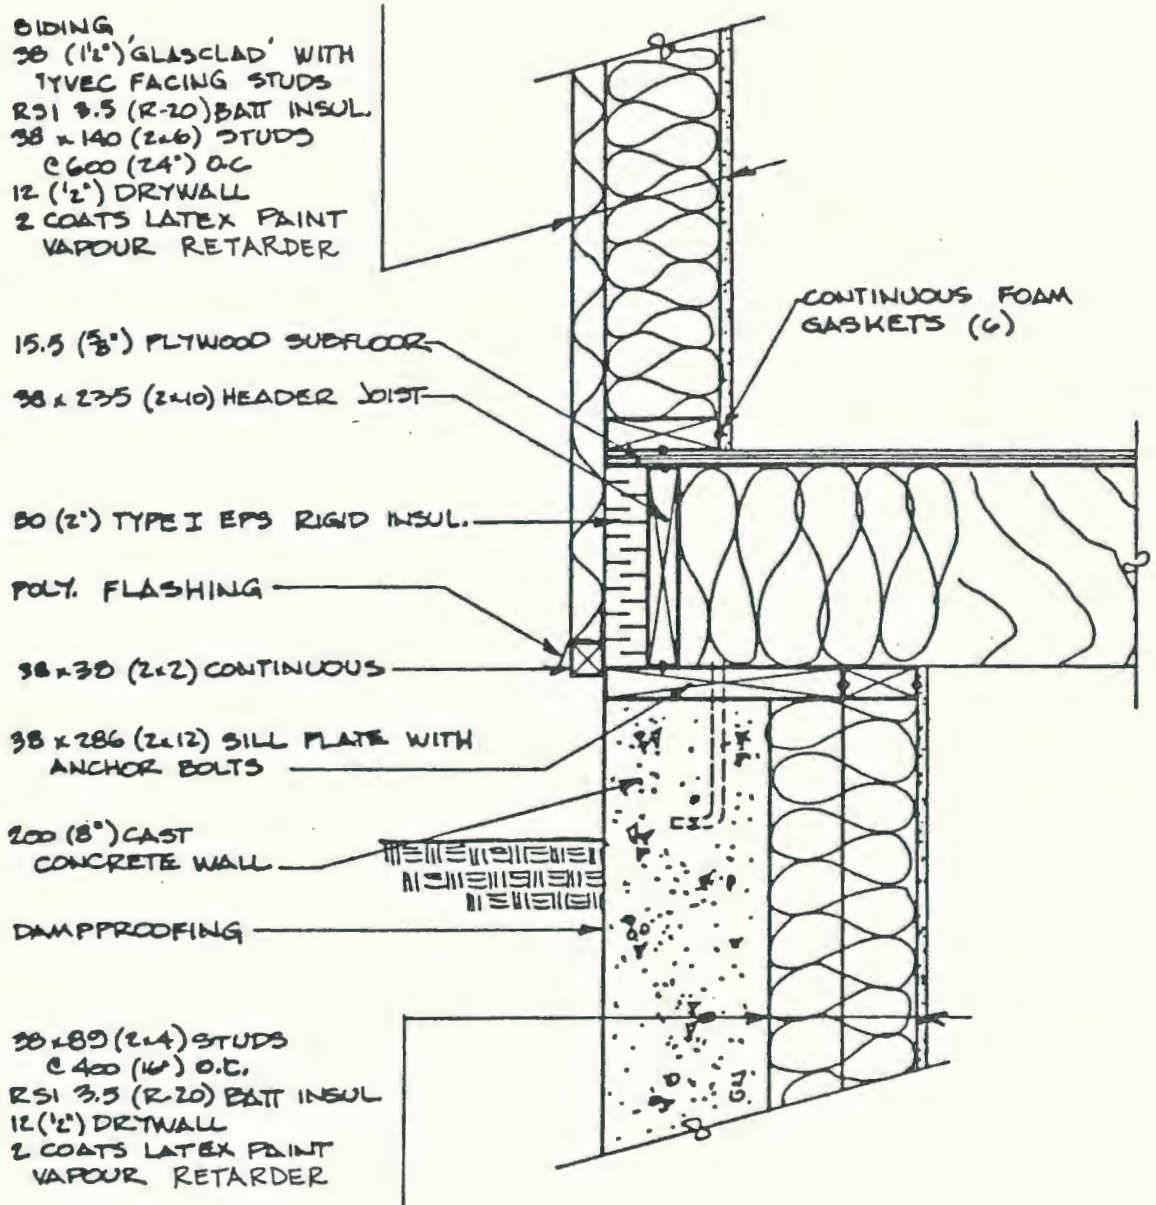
Alternative Detail for Top of Foundation Wall--
